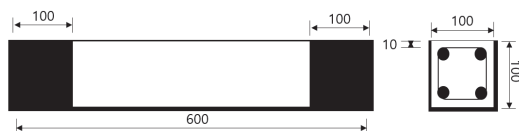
Dimension of RC beam strengthened by carbon fiber sheet and end anchorage
